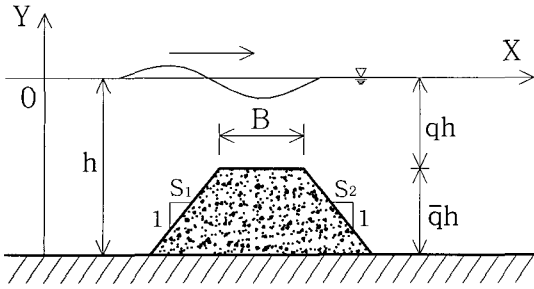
Sketch of Trapezoidal Typed Impermeable Submerged Breakwater.
